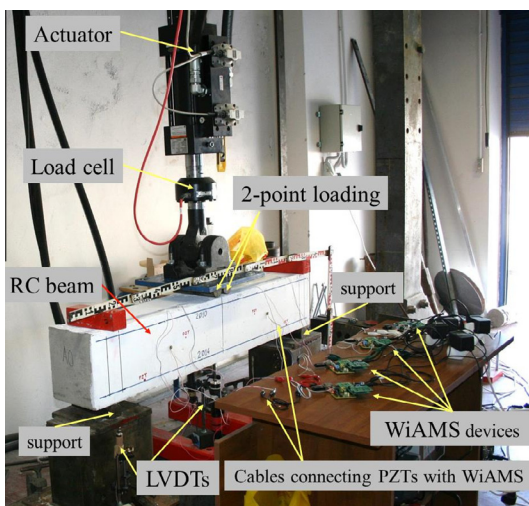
Test setup and wireless monitoring system of large-scale RC beams.
